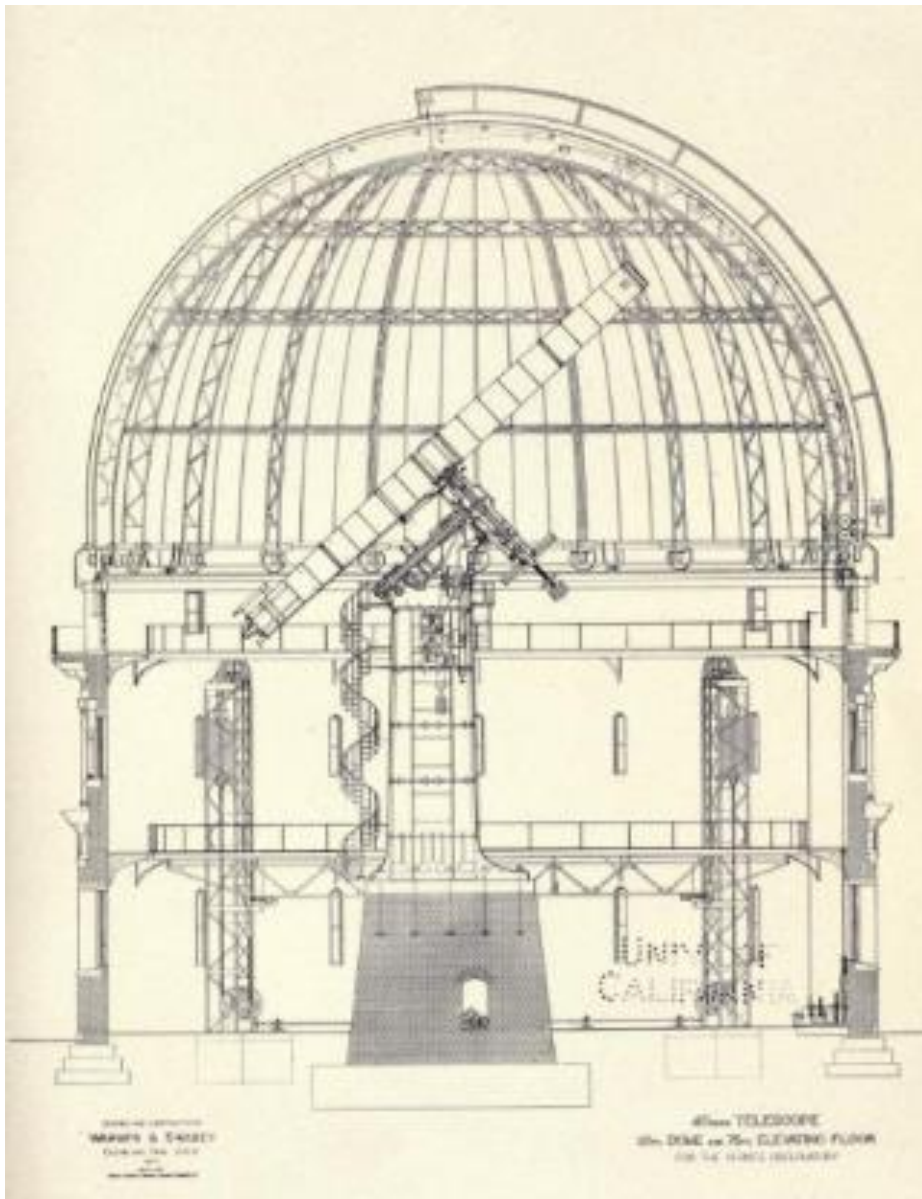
40-inch Telescope, 90-foot Dome, and 75-foot Elevating Floor. Yerkes Observatory, Williams Bay, Wisconsin. Warner & Swasey. (1897)
